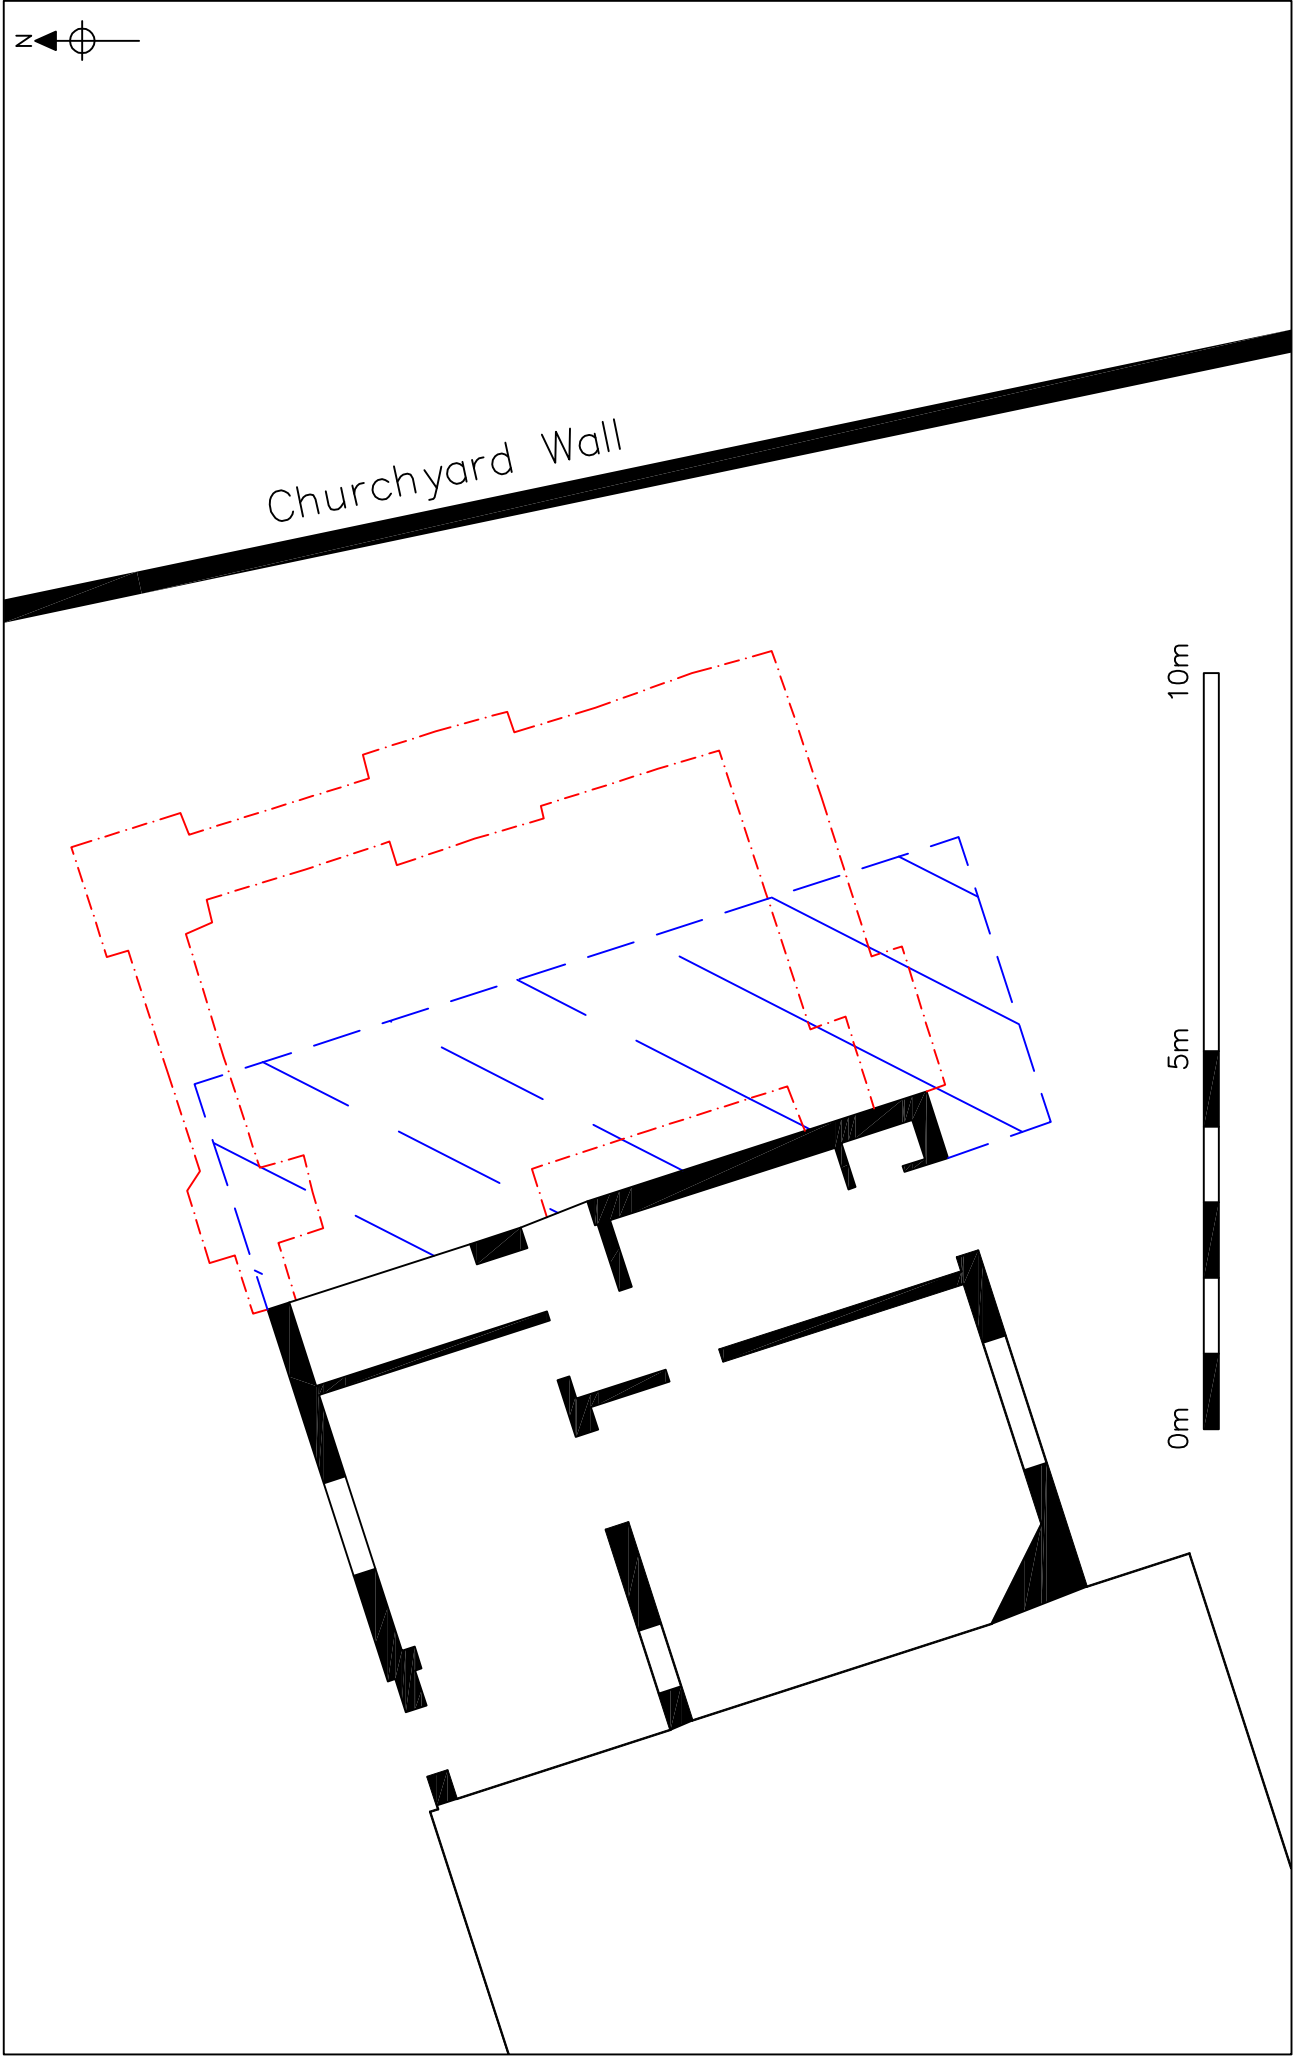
Showing footing trenches (red) and area of previous disturbance (blue). Scale 1:100.
